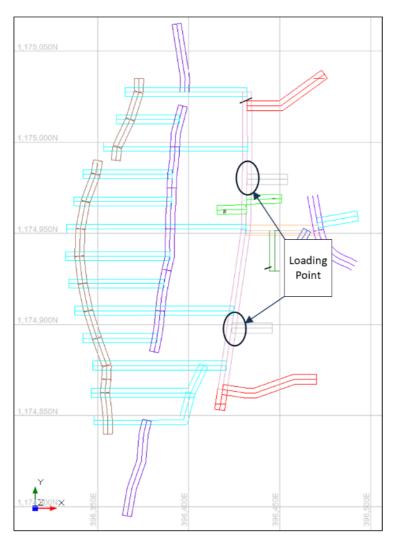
Level Layout Showing Loading Points - 9980 mRL
